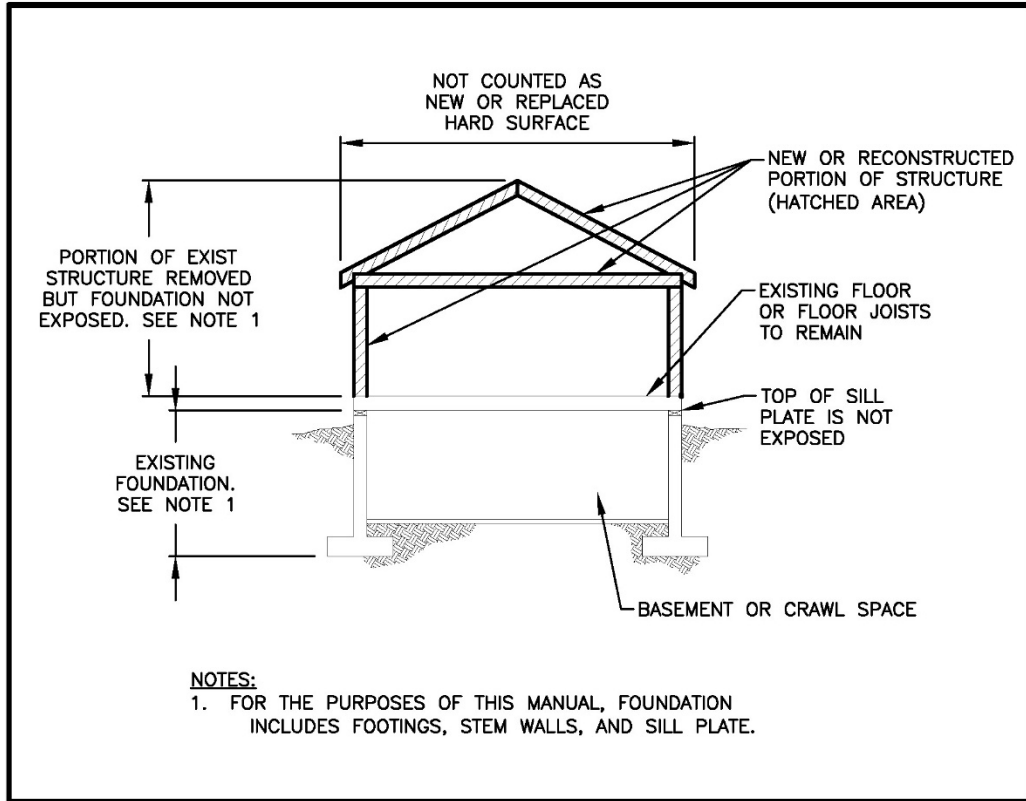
Example of Existing Hard Surface to Remain with Existing Floor Joists to Remain.
